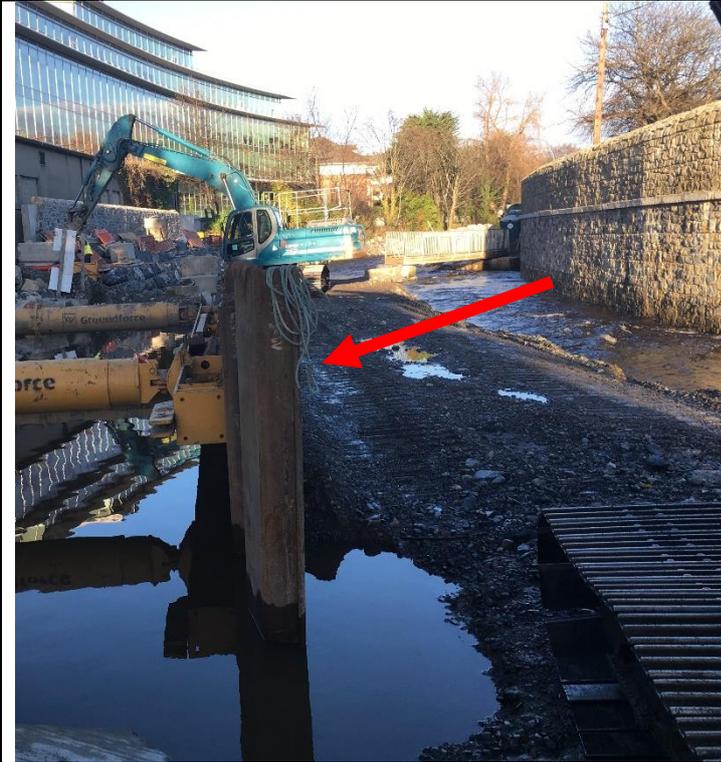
Example of temporary piles installed in the haul road during works. Note – this photo is for illustration only, it does not represent the exact layout of the proposed works.
